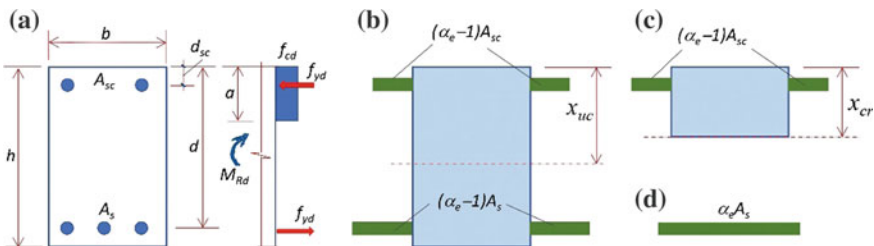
RC Beam a cross-section, b stresses at ultimate limit state, c transformed section with concrete uncracked, d transformed section with concrete cracked
